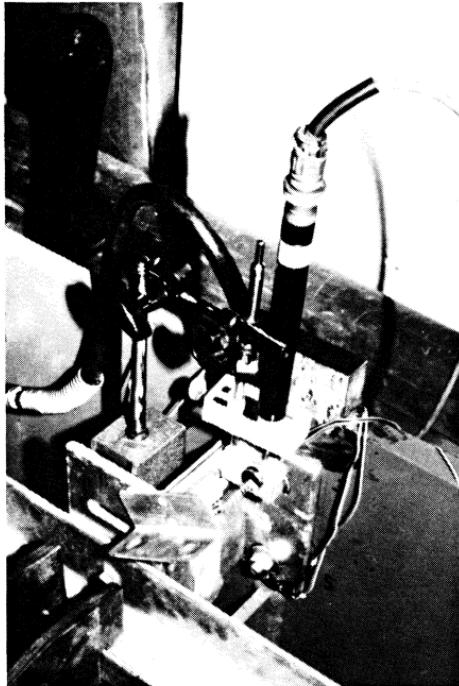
Test of steel connection system in WJE laboratory.
